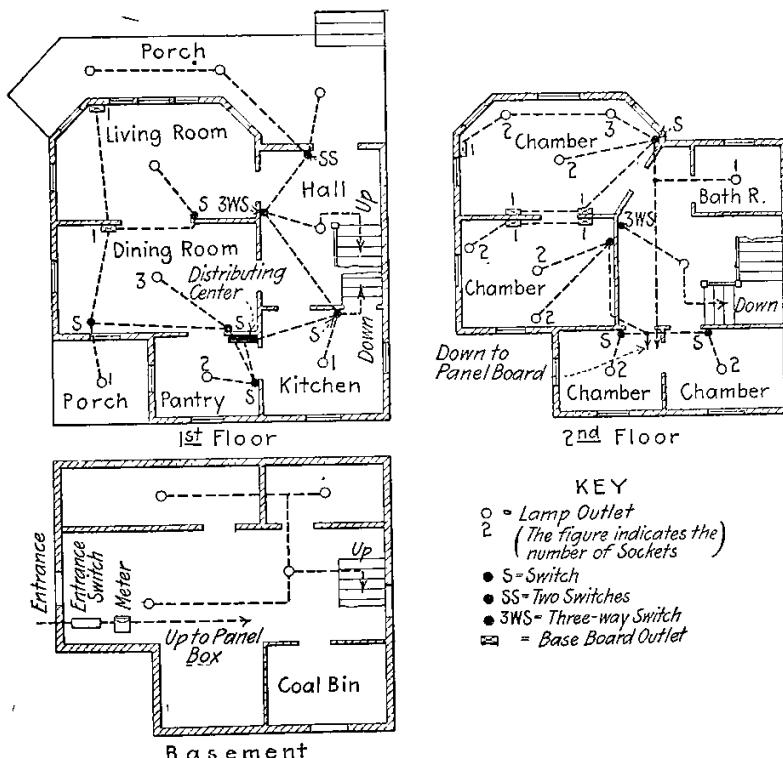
Wiring lay-out in a two-story house (Conduit Method).
